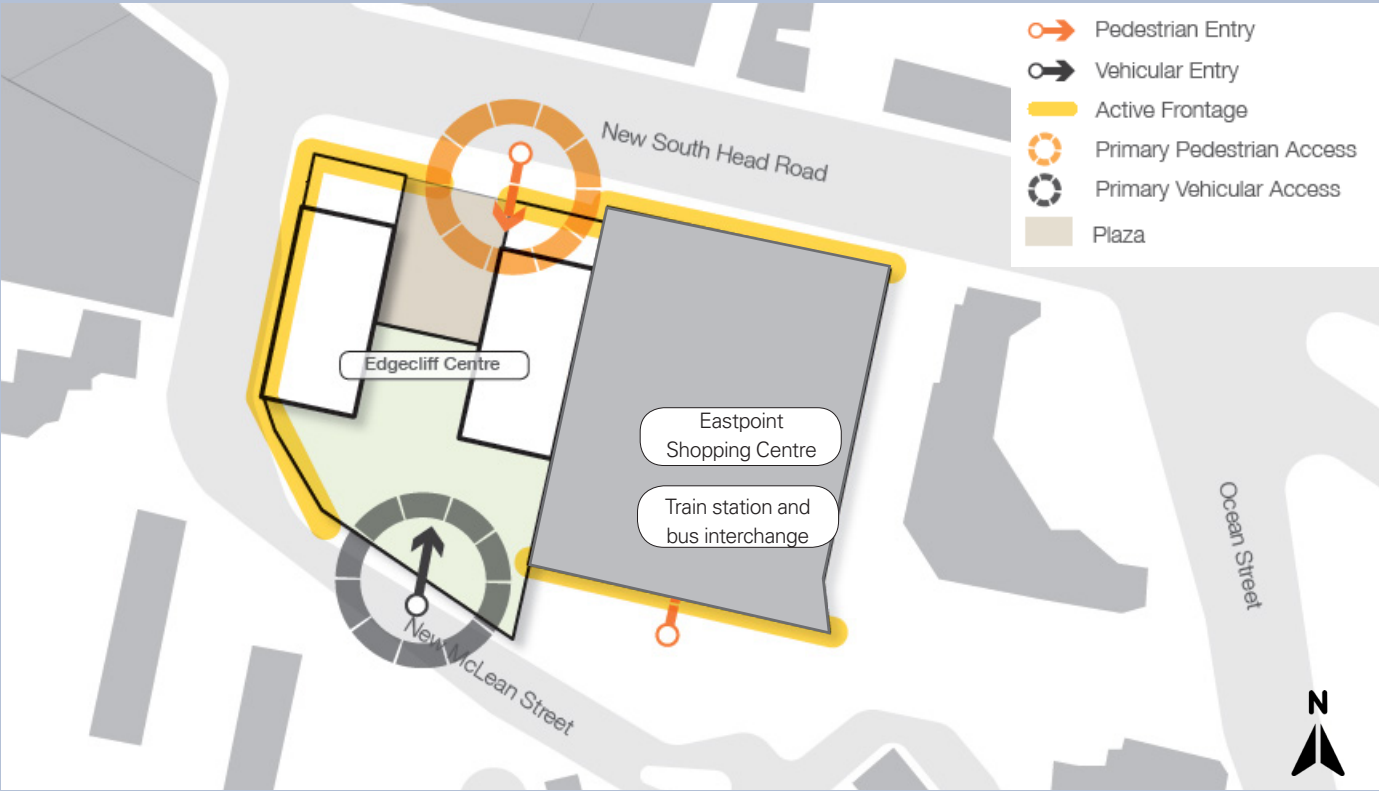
Concept plan of envisioned development at 203-233 New South Head Road(SJB 2018)
